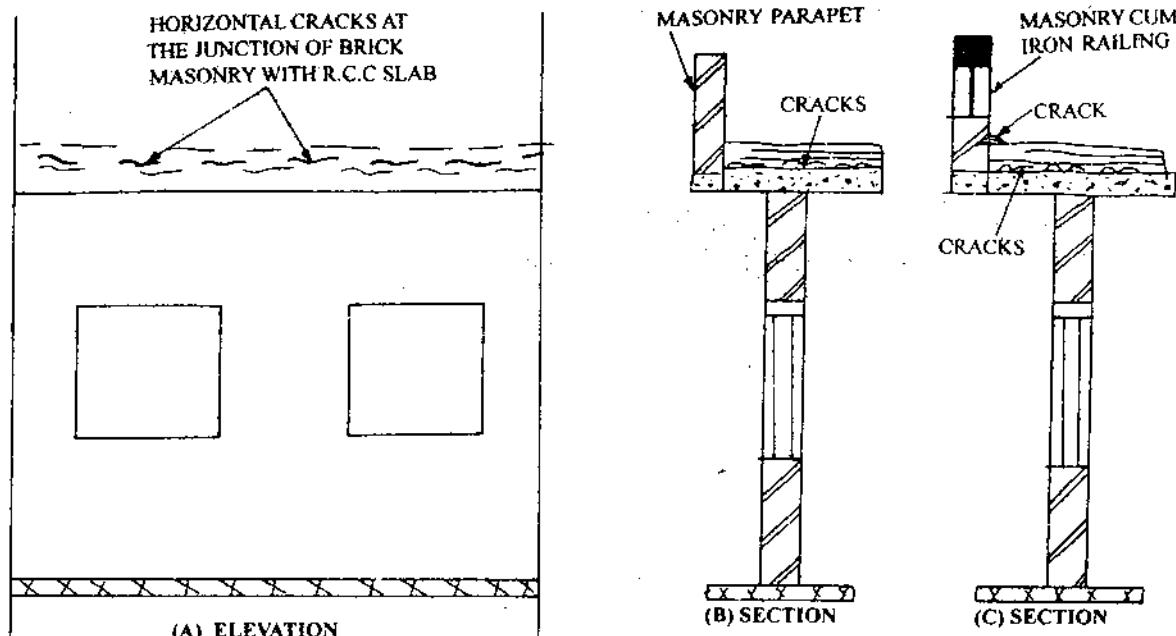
Horizontal cracks at the base of brick masonry parapet etc.
